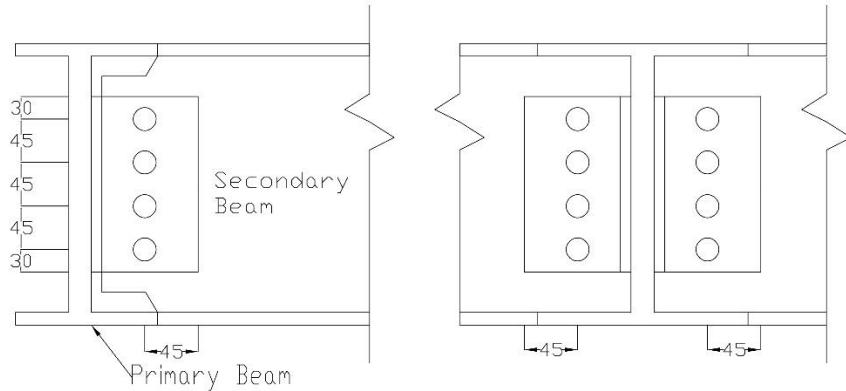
Figure showing the configuration of beam-to-beam connections
